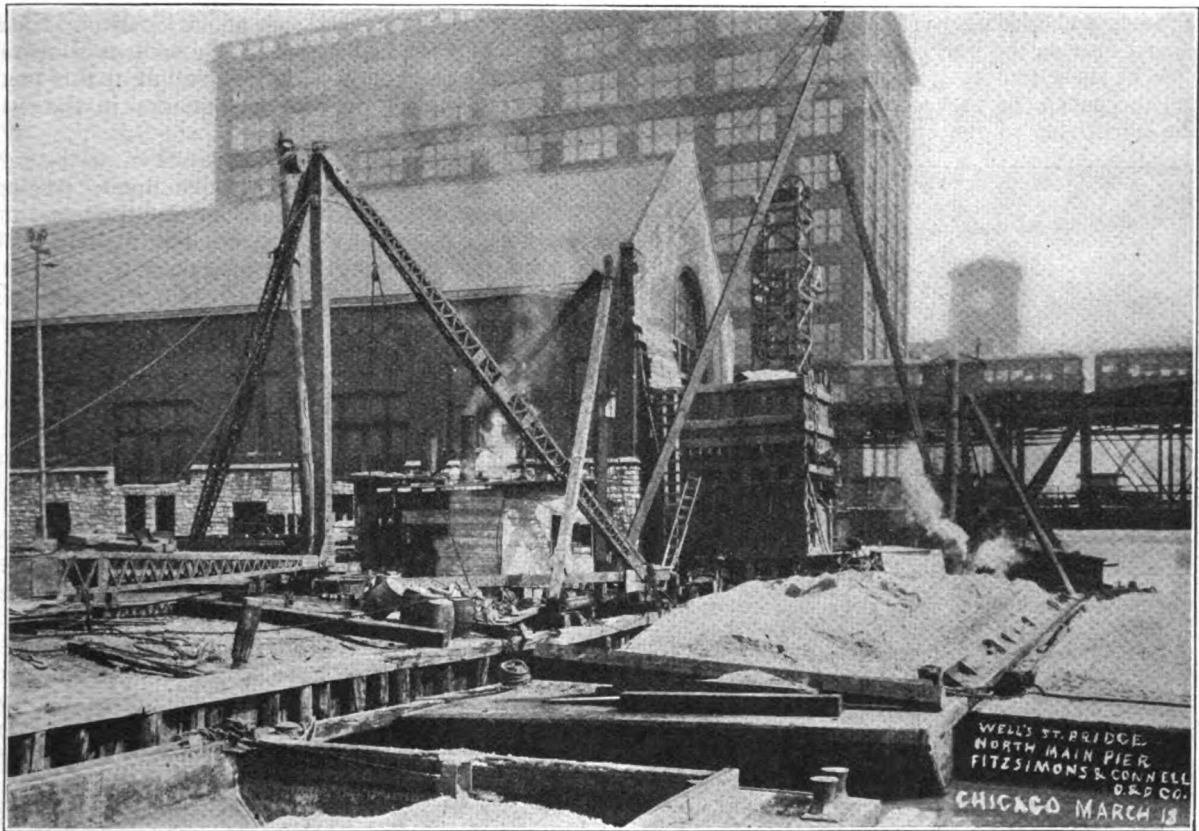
Aggregate Handling and Concrete Mixing Plant Used at Wells Street for Constructing Main Piers and Tail Pit.
